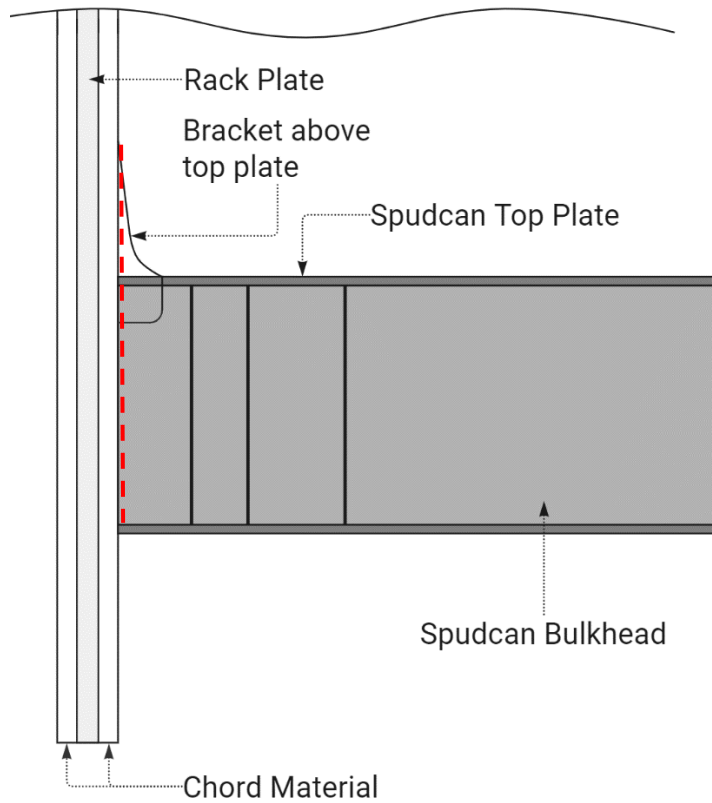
Structural details at the spudcan to leg transition. The red line shows positions where cracking has occurred.
